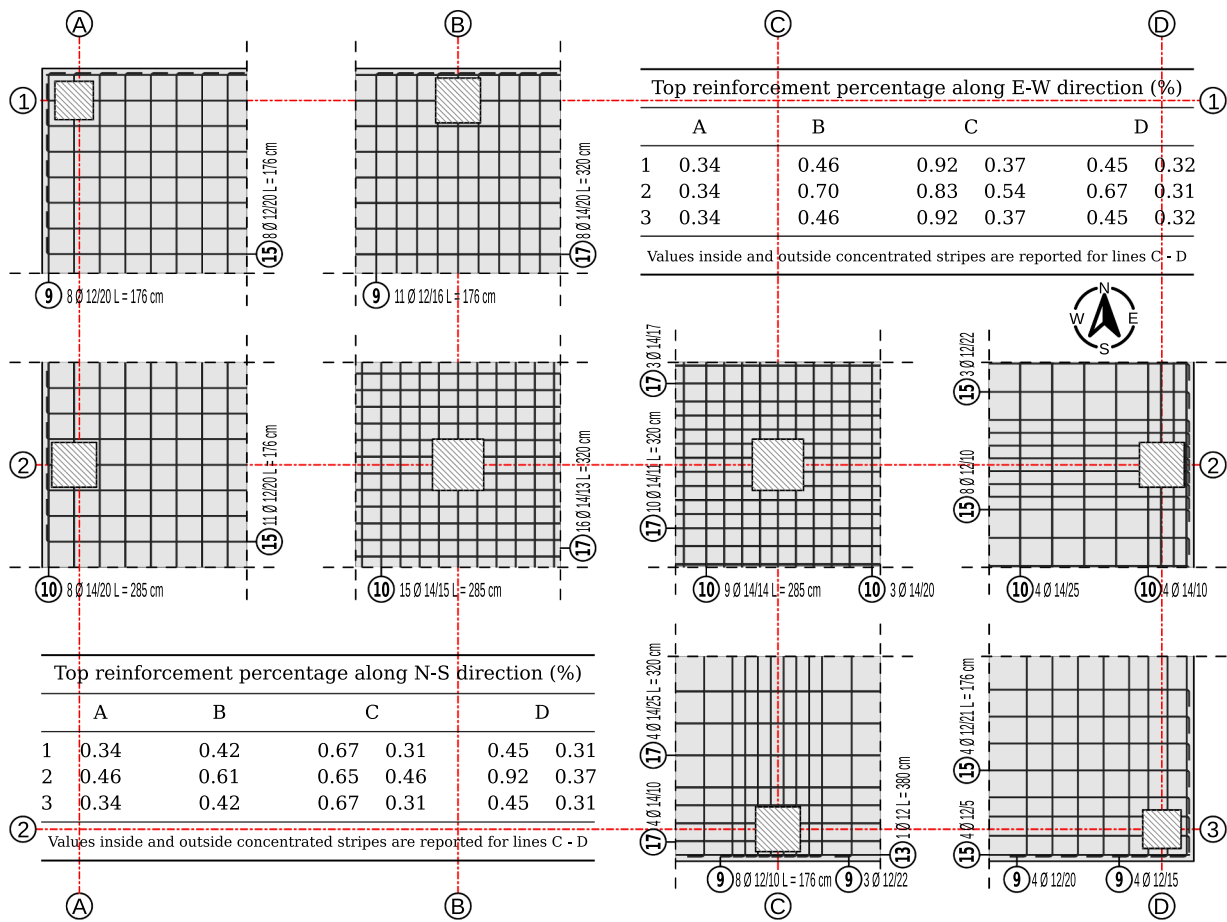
Top longitudinal reinforcement in the slab around columns.
